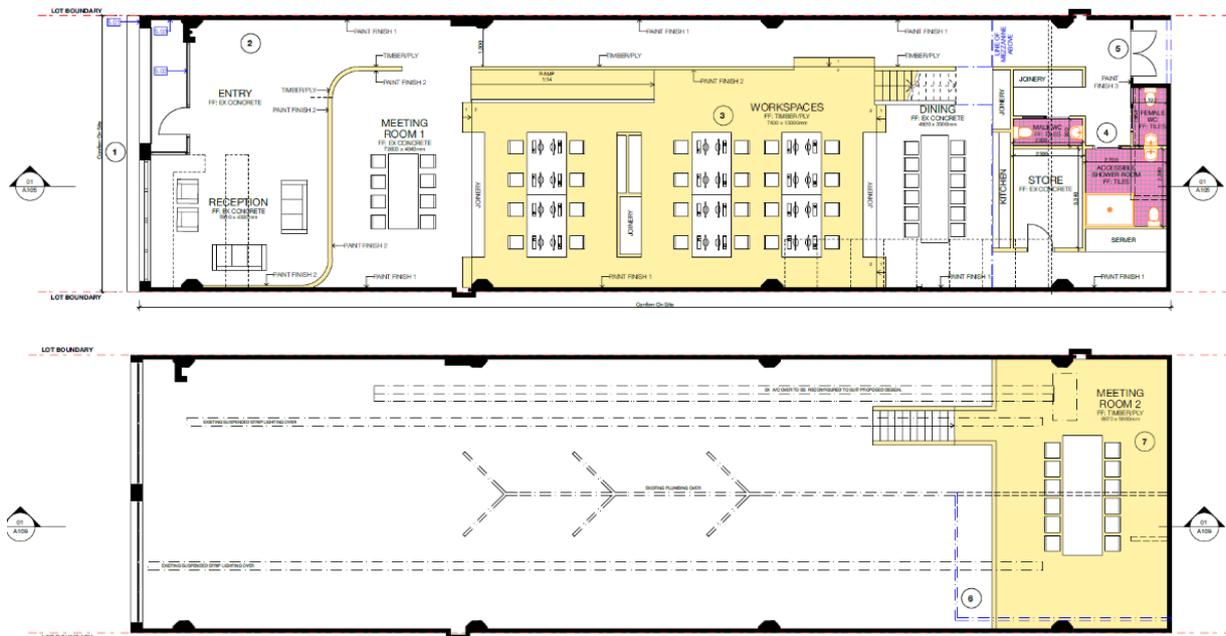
Proposed Ground Floor and Mezzanine Floor Plans.
